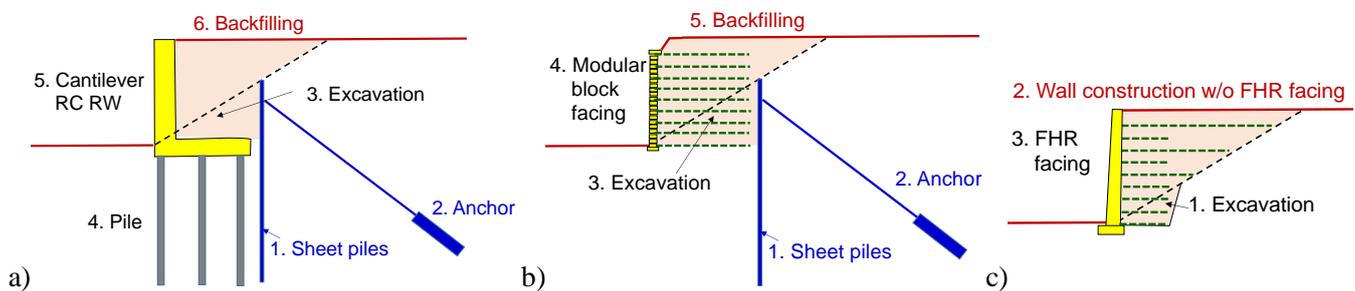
Construction of RW on slope: a) conventional cantilever RC RW; b) reinforced soil RW with relatively long reinforcement; and c) GRS RW having FHR facing with several long geogrid layers at high elevations and short geogrid layers at low elevations (Tatsuoka et al., 1997b). Note: Numbers refer to construction stage.
